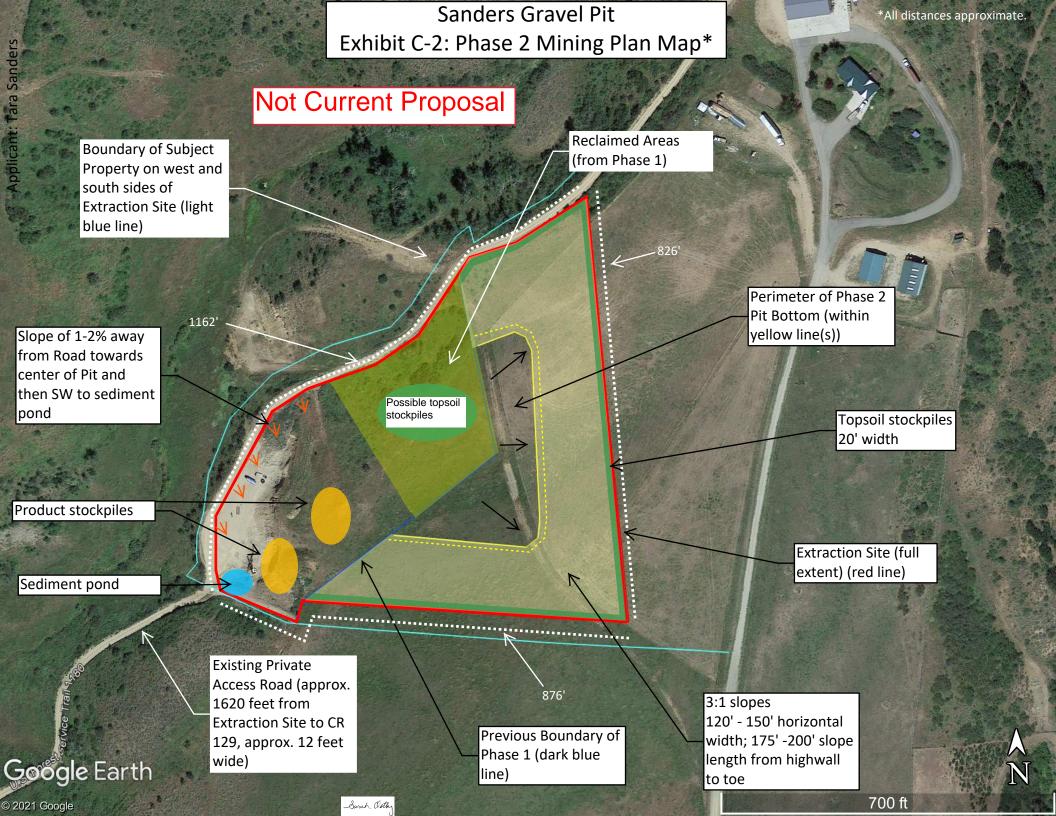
Phase 1 Mining Plan Map Exhibit C-2: Phase 2 Mining Plan Map Exhibit C-3: Stormwater Management Plan
